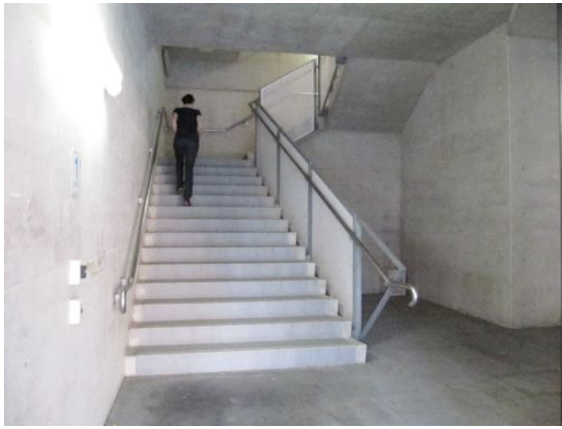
Staircase on Ground Floor - possible planter location at the bottom right hand side of stair railings
